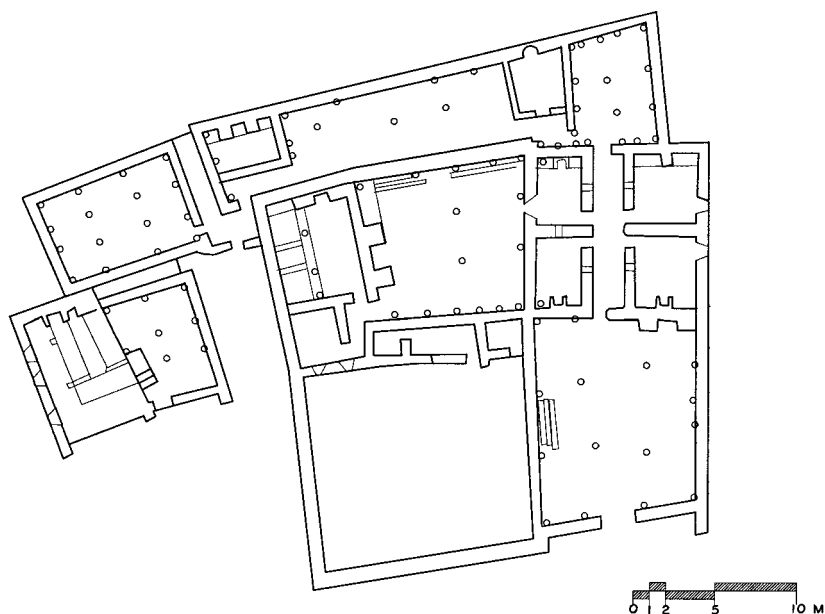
Redrawn plan of Mehmet Effendi house, after Morrison, with (from left to right) village room, hay storage, barn, sleeping rooms, house storage and large open walled courtyard, and four women's room with a covered hayat space in front of them to the right of the courtyard.
